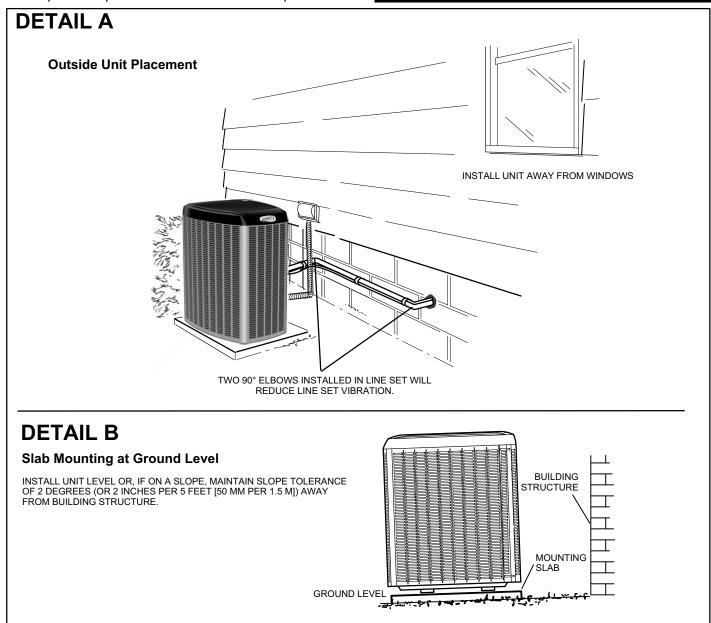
Placement, Slab Mounting and Stabilizing Unit
